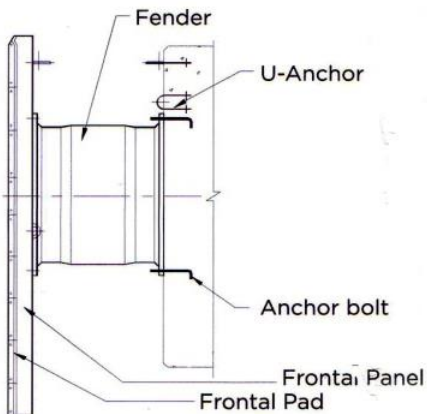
Install the Fender & Frontal Panel onto berthing face by fastening the fixing Bolts to Cast in Anchors
